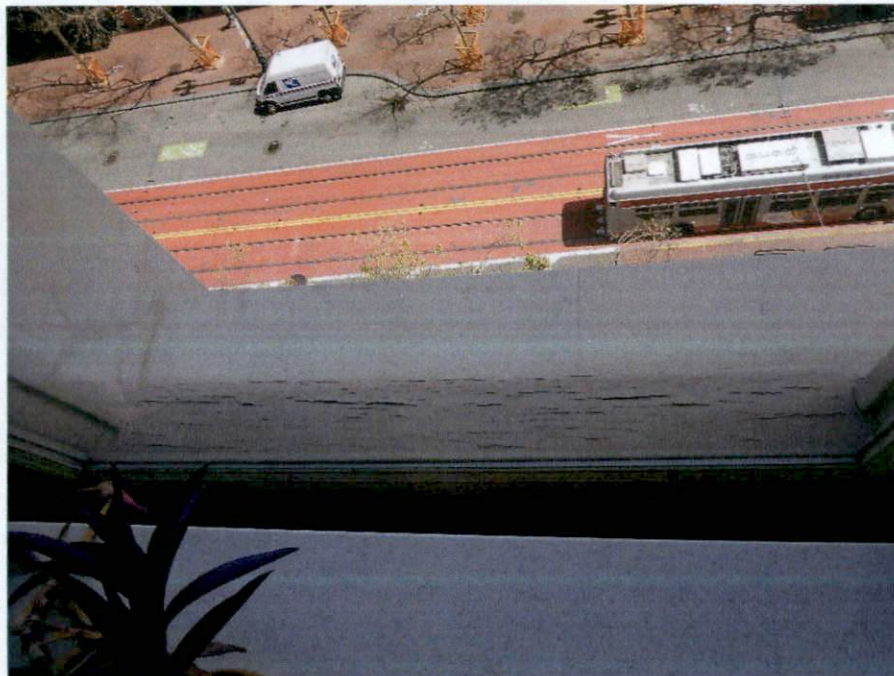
Photo AA: Detail view of deteriorating wood windowsill on sixth level along Market Street elevation, looking south.
